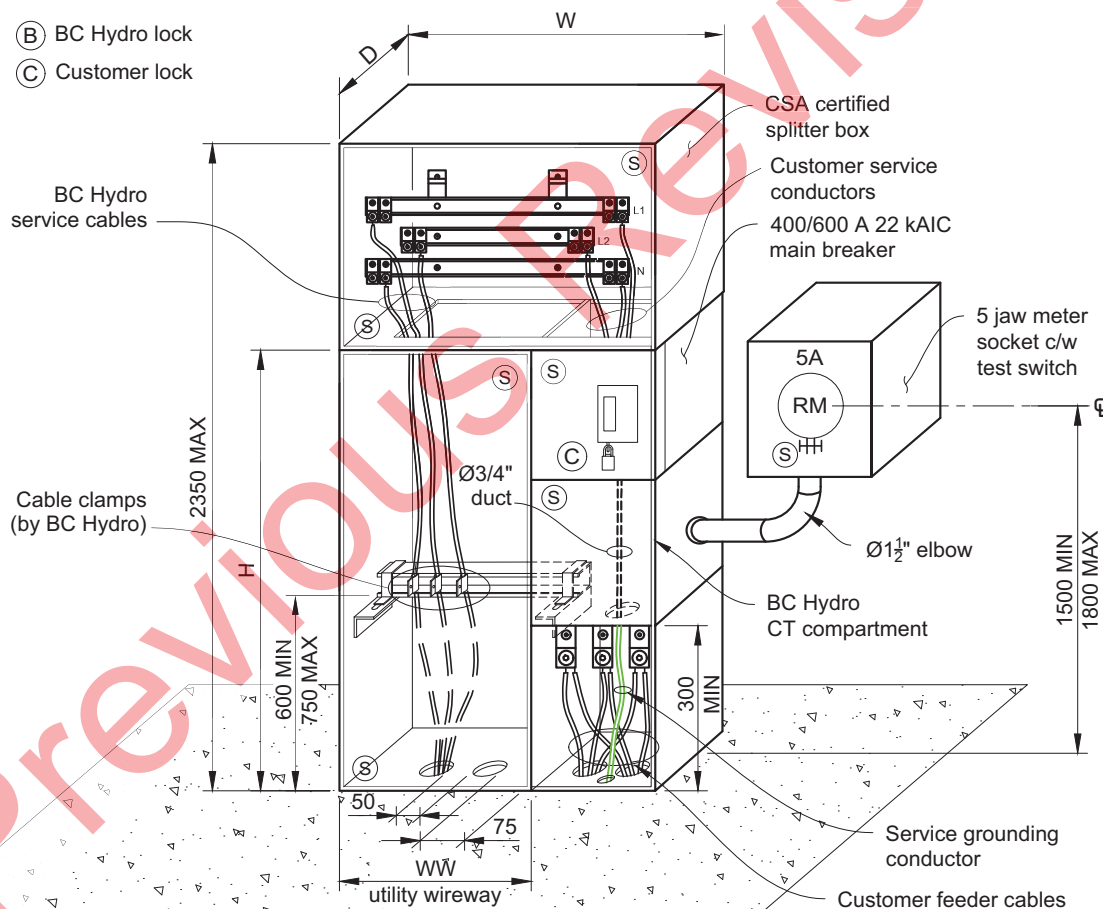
Prefabricated integral assembly up to 600 A, bottom entry
